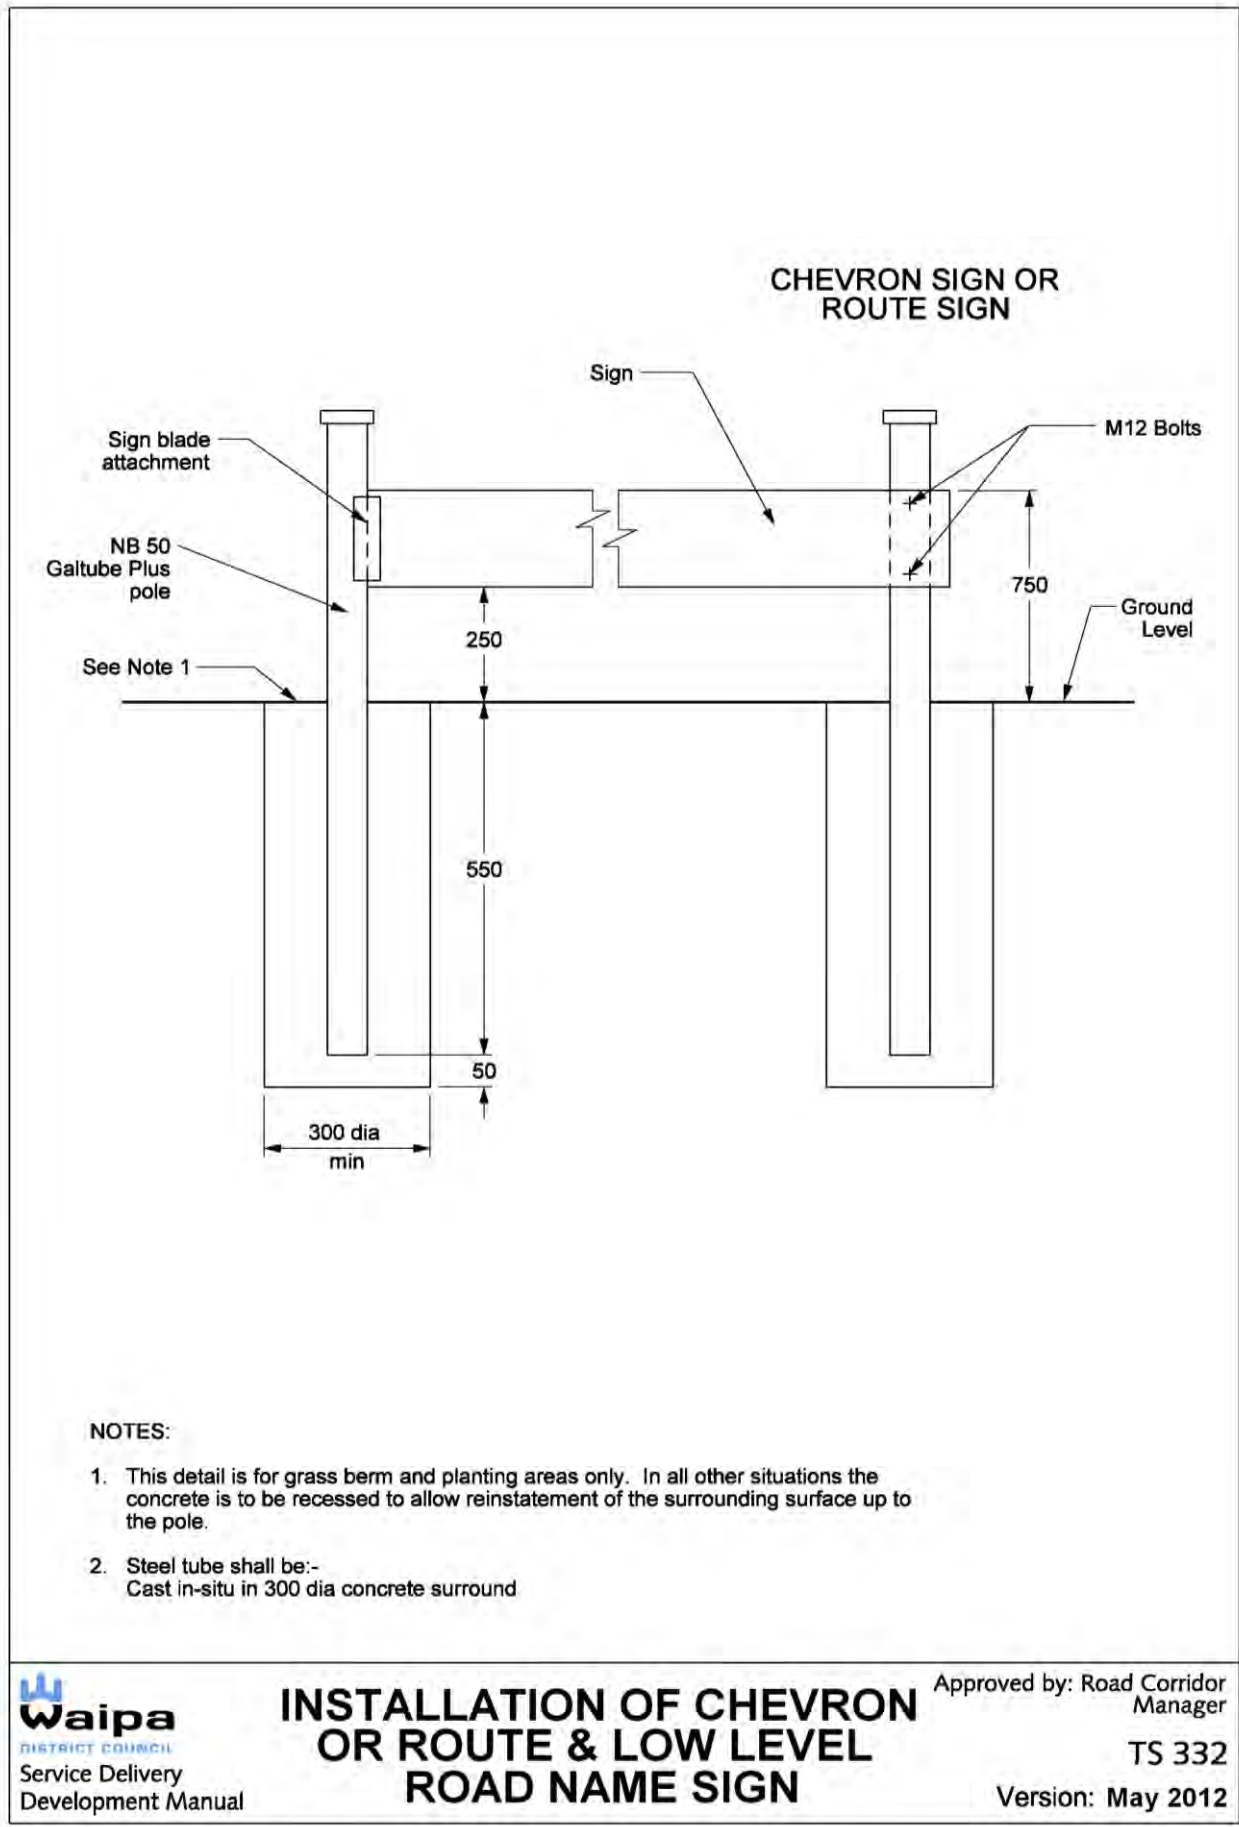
TS 332 Installation of chevron or route and low level road name sign
